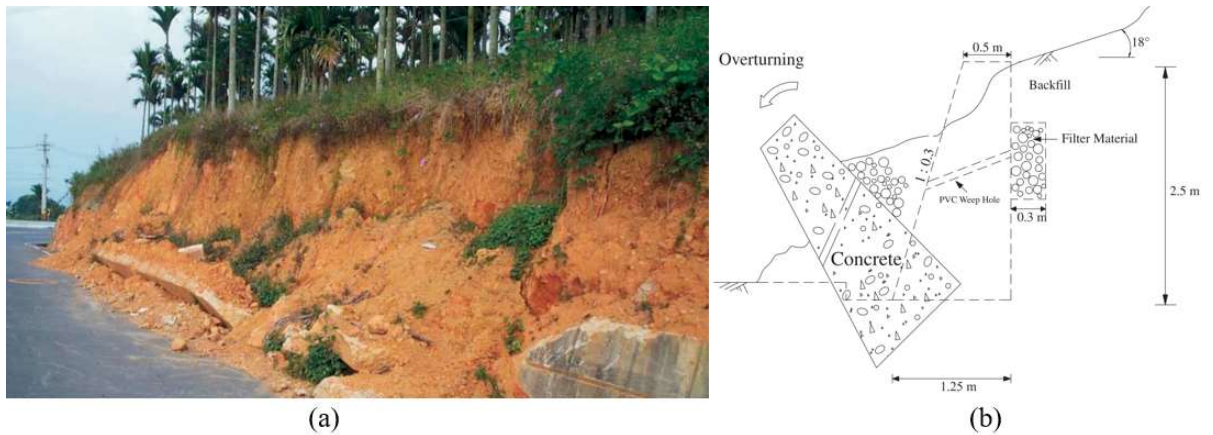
(a) The picture of the failed gravity wall, (b) The cross sections of failed wall [11].
